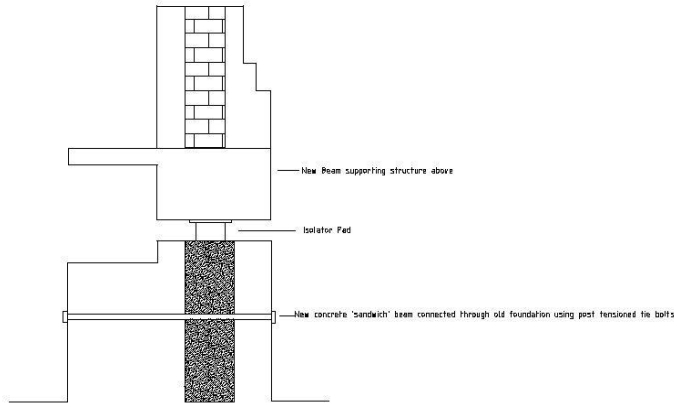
Strengthening of Foundations below NZ Parliament House and location of isolators
